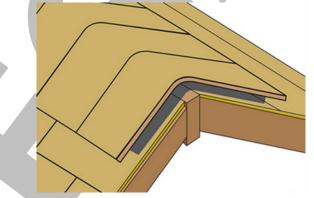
Ridge Cap Shingles Installed Post Shear-X™ Installation
